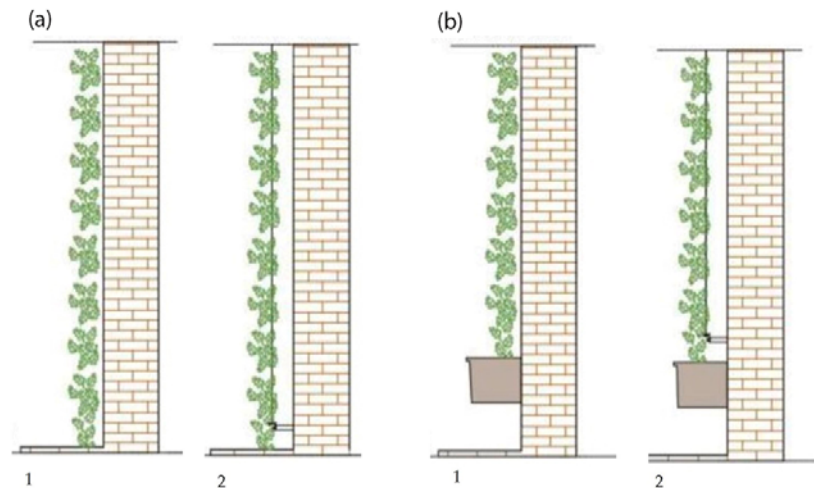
(a) Utilization of self-climbing plant species (1) in direct contact with the wall (2) supported by a dedicated structure for the implementation of a green façade. (b) Green façade using plants rooted in the box (1) planter box at the bottom with plants directly on the wall, (2) planter box at the bottom with plants on supporting structure. Source: [28].
